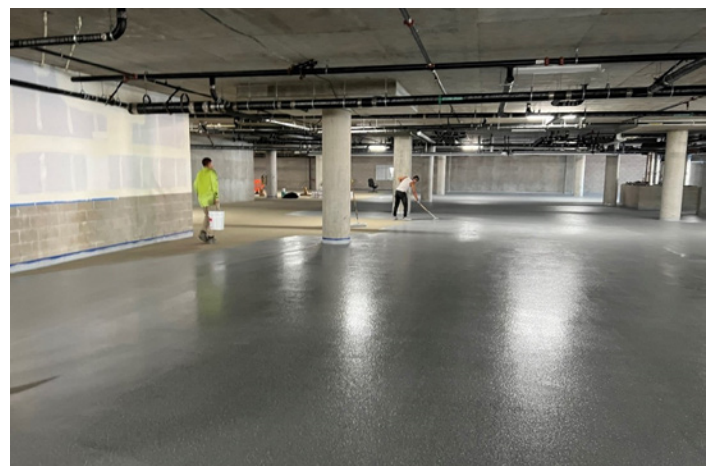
TYPICAL ASSEMBLY OVER CONCRETE
